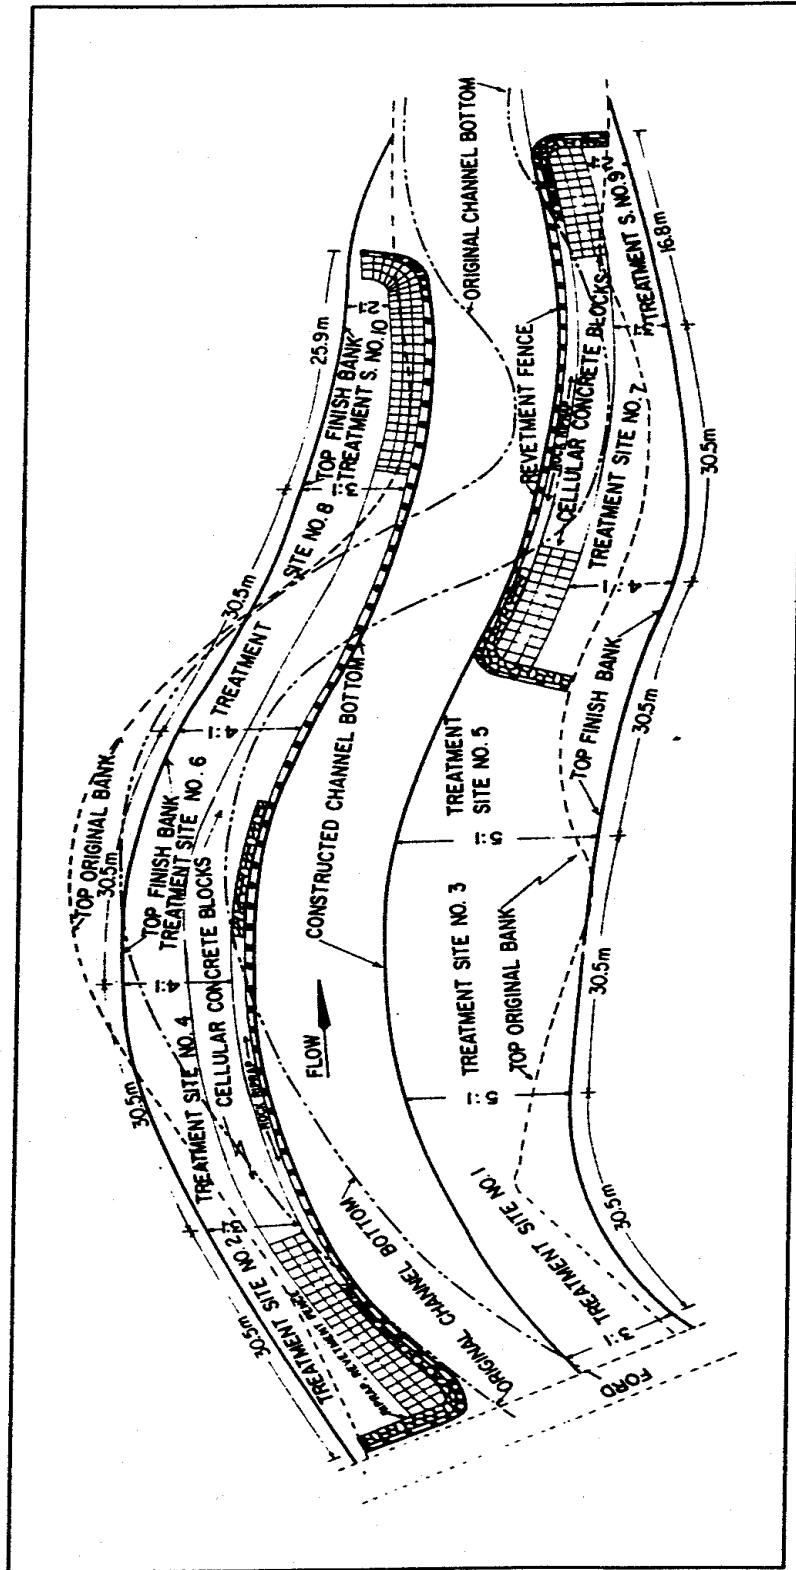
Site Plan of Goodwin Creek Study Reach
